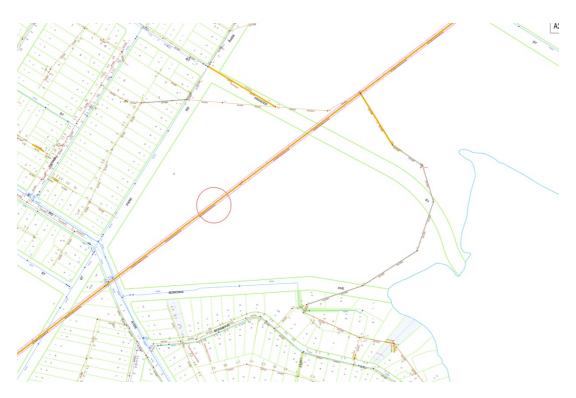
The Northern Suburbs Ocean Outfall Sewer under the site (marked in red). (Source: DJRD Architects)
